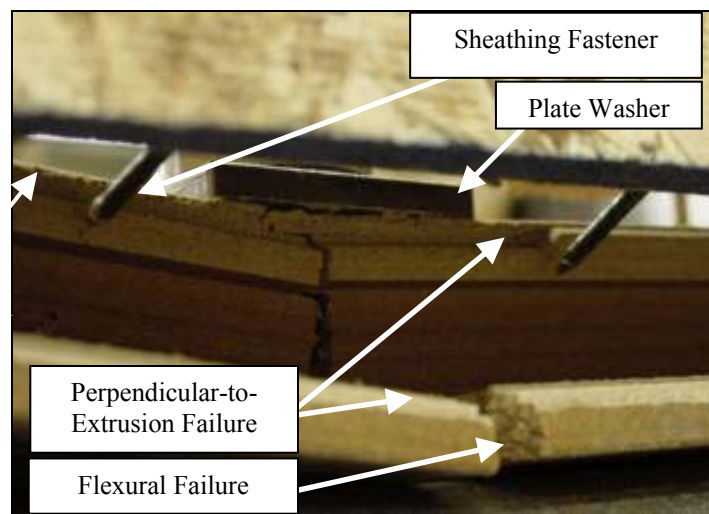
View of failure at anchor bolt location, shown from outside bottom edge
